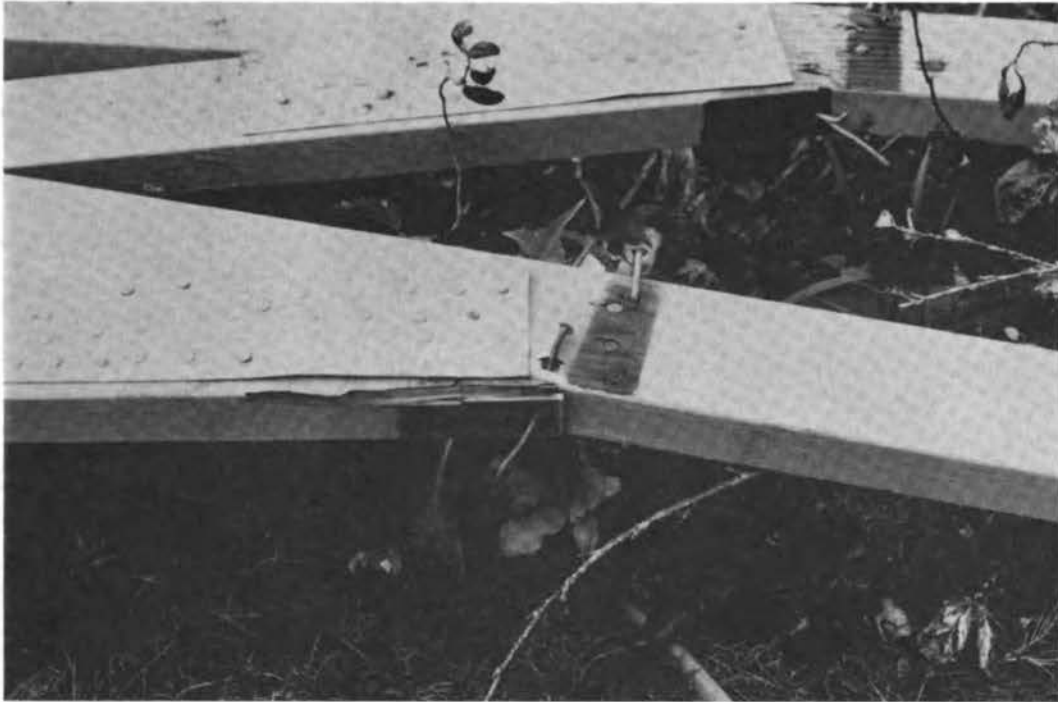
Toe nailing of prefabricated roof trusses to stud walls (note a single fastener is used for anchorage).
